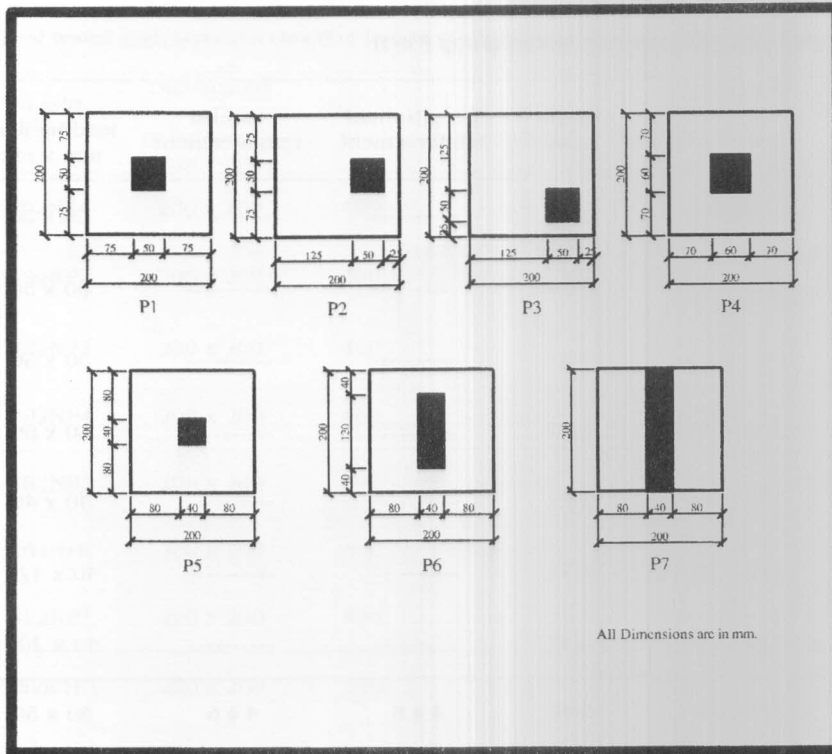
Loading patterns for tested high strength concrete blocks groups GS1 and GS2.
